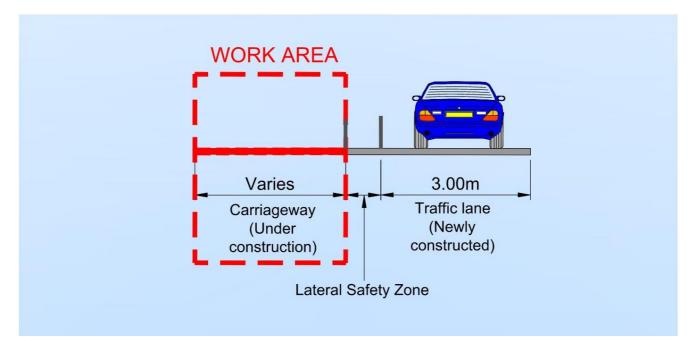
Traffic Management Cross Section, Section 1b – Stage 2
